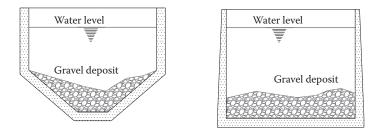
A hopper-shaped and a rectangular-shaped gravel trap.
